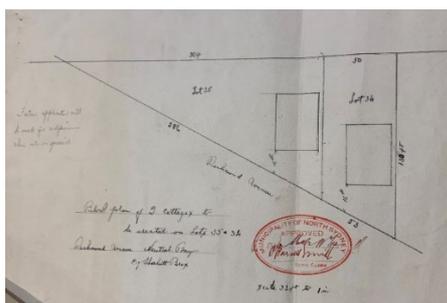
26: Block plan submitted with Building application 12/334 for the construction of Nos. 8 and 10 Richmond Avenue.
